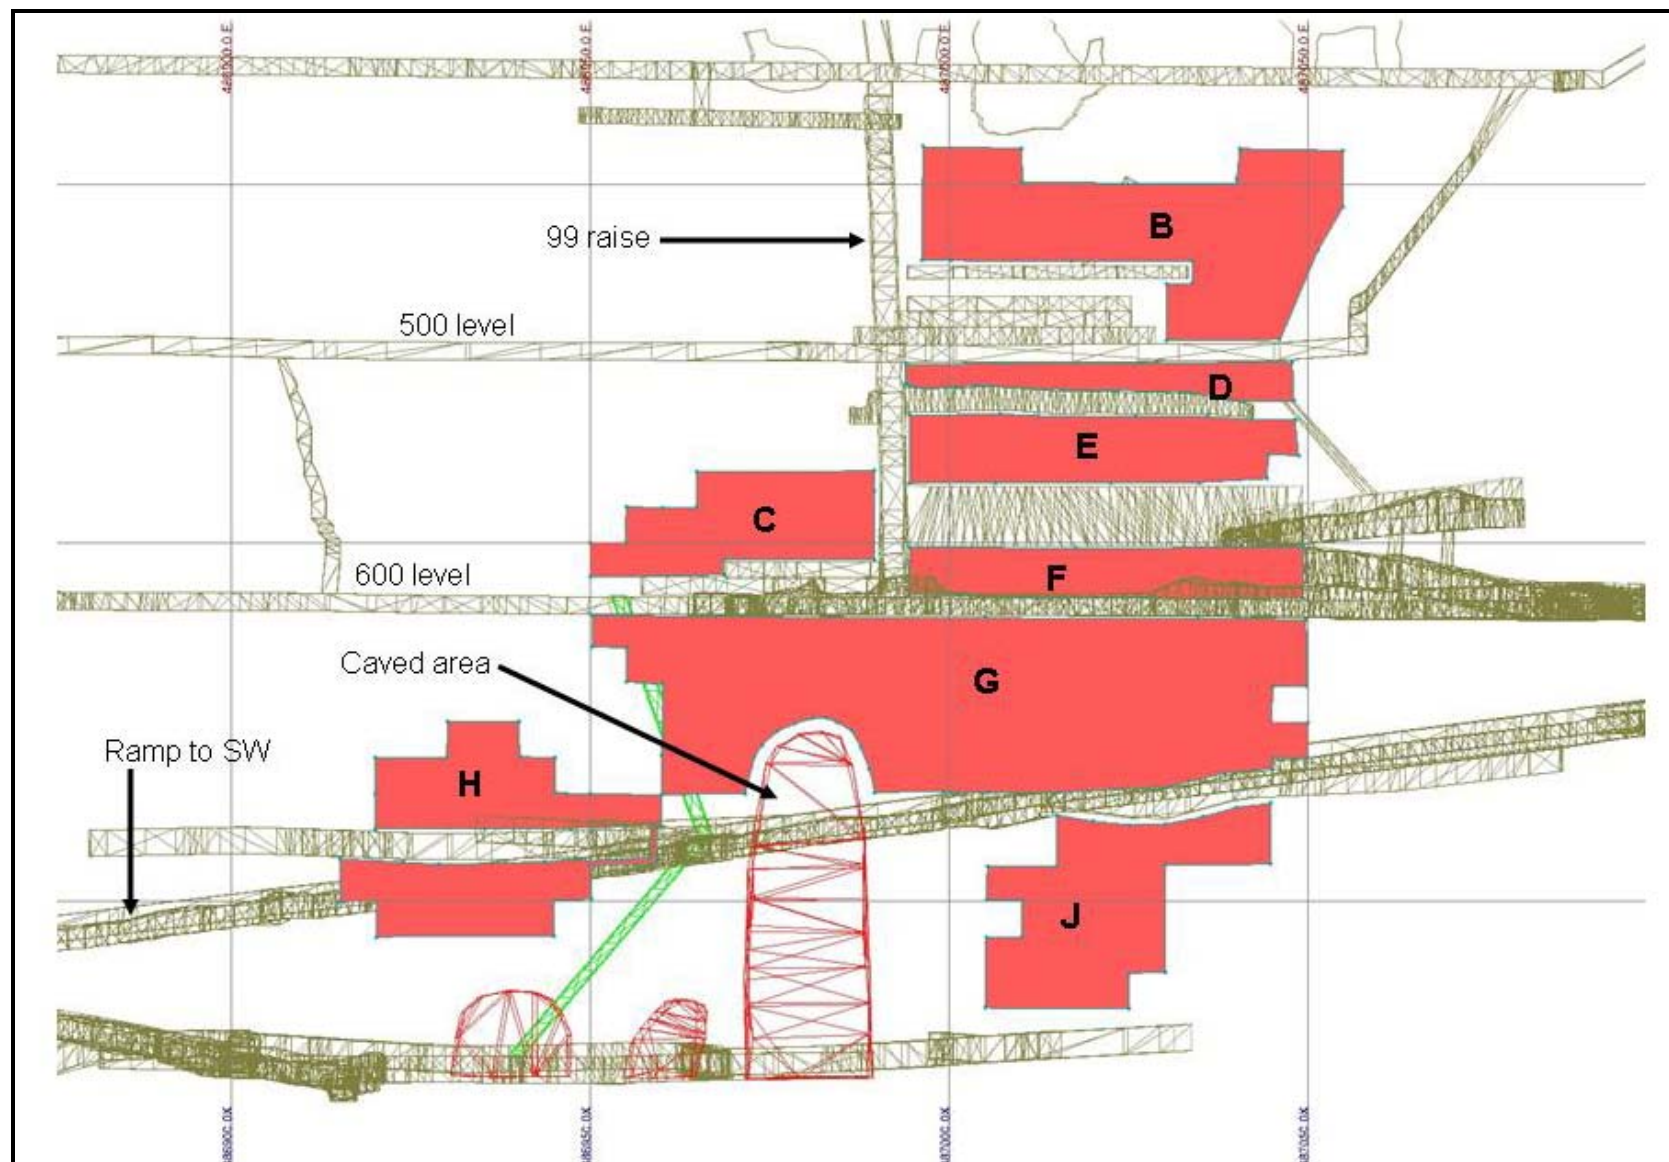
99 Long Section with Mining Blocks (red) – Looks West
